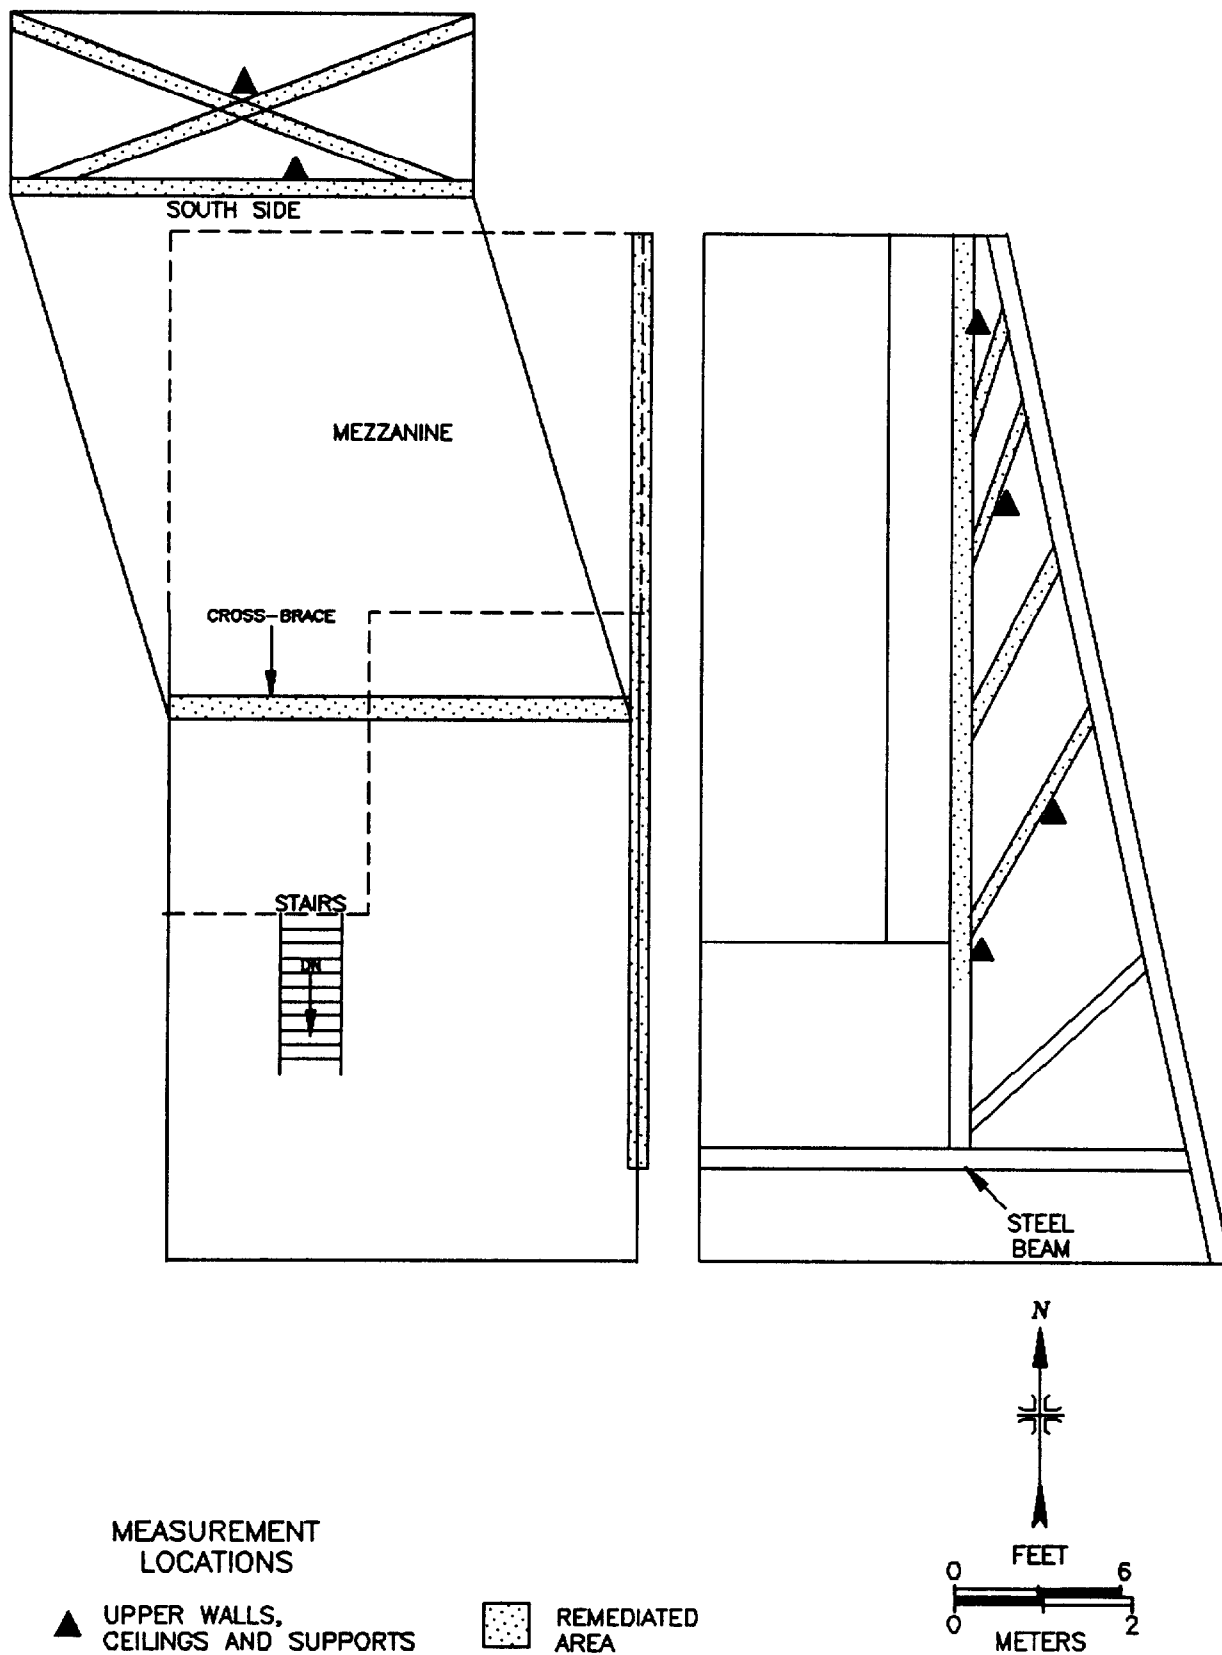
Building 28, Attic (Accessed from Lab 12) – Remediated Areas and Measurement and Sampling Locations
